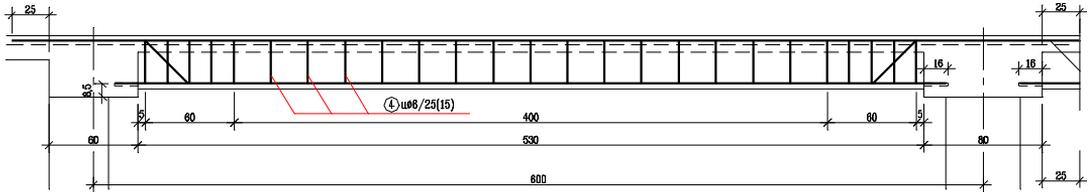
The new beam reinforcement plan: longitudinal cross-section
